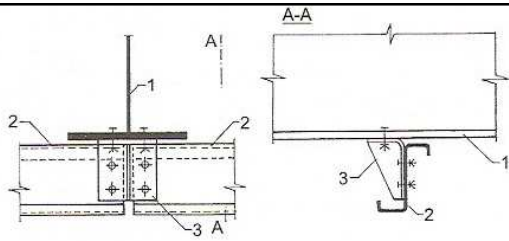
Cold-formed girt to double tee column connection: 1- secondary column, 2- wall girt, 3- bearing ribbed angle
